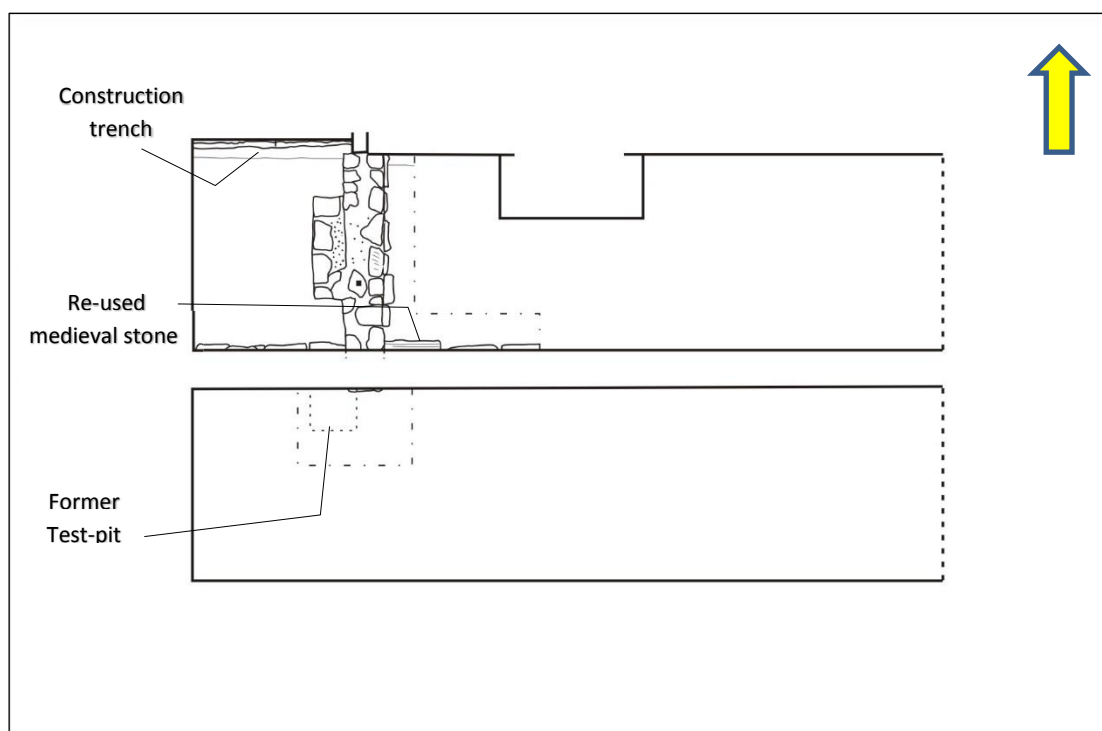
Plan of the two compartments with the newly exposed wall in detail (Scale 1:100)
